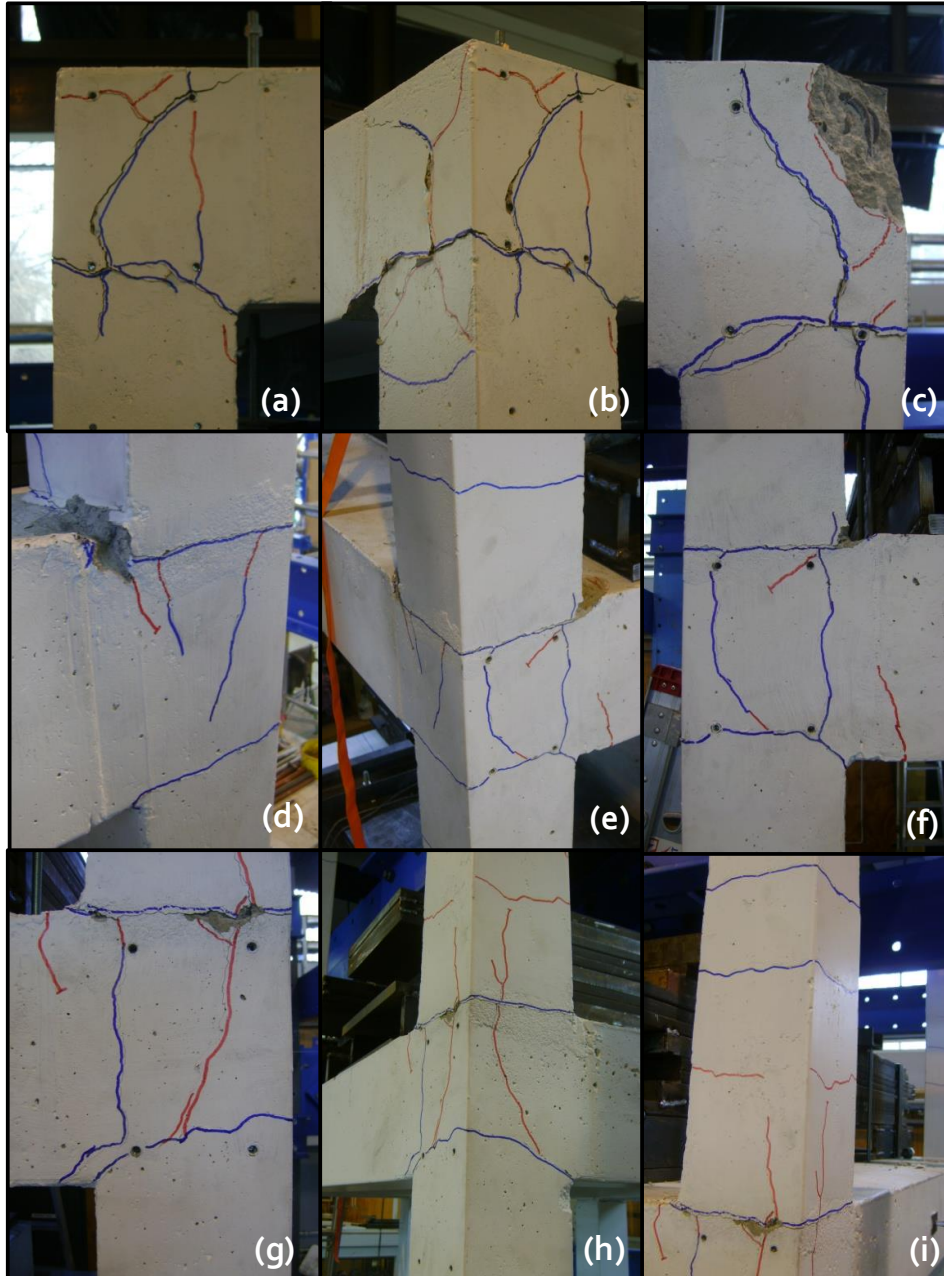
Observed damage after the *real* Darfield Earthquake which affected Christchurch on February the 4th 2010: (a) top floor, long span joint front view, (b) top floor, long span joint 3D view, (c) top floor, short span joint front view, (d) second floor, long span joint side view, (e) second floor, long span joint 3D view, (f) second floor, long span joint front view, (g) second floor, short span joint front view, (h) second floor, short span joint 3D view, (i) second floor, short span column view.
